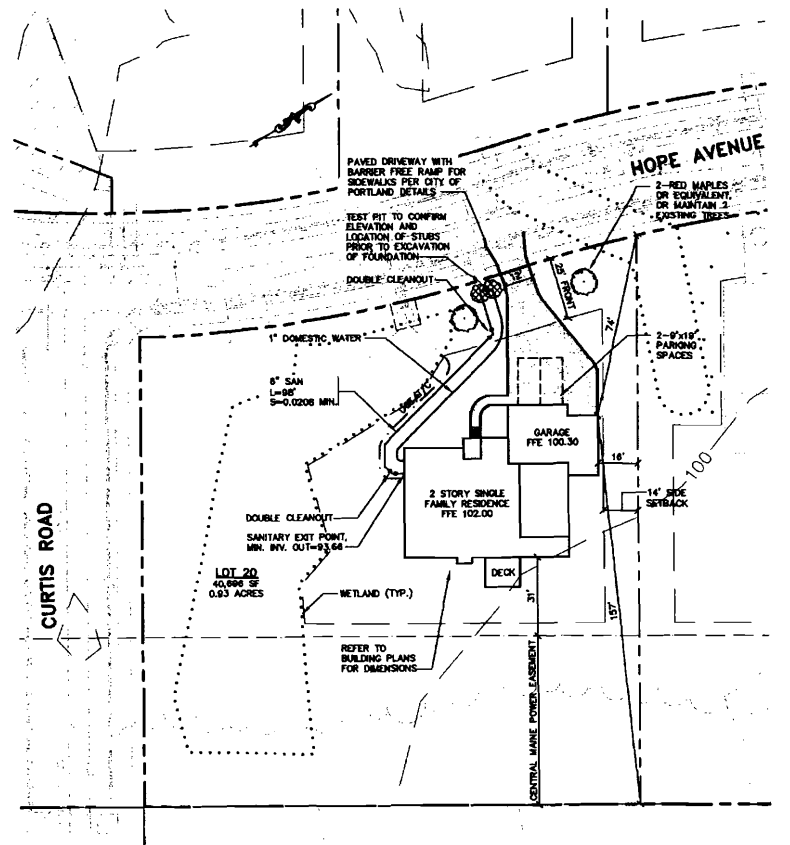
Hope Ave. Lot 20 Site Layout & Utility Plan
